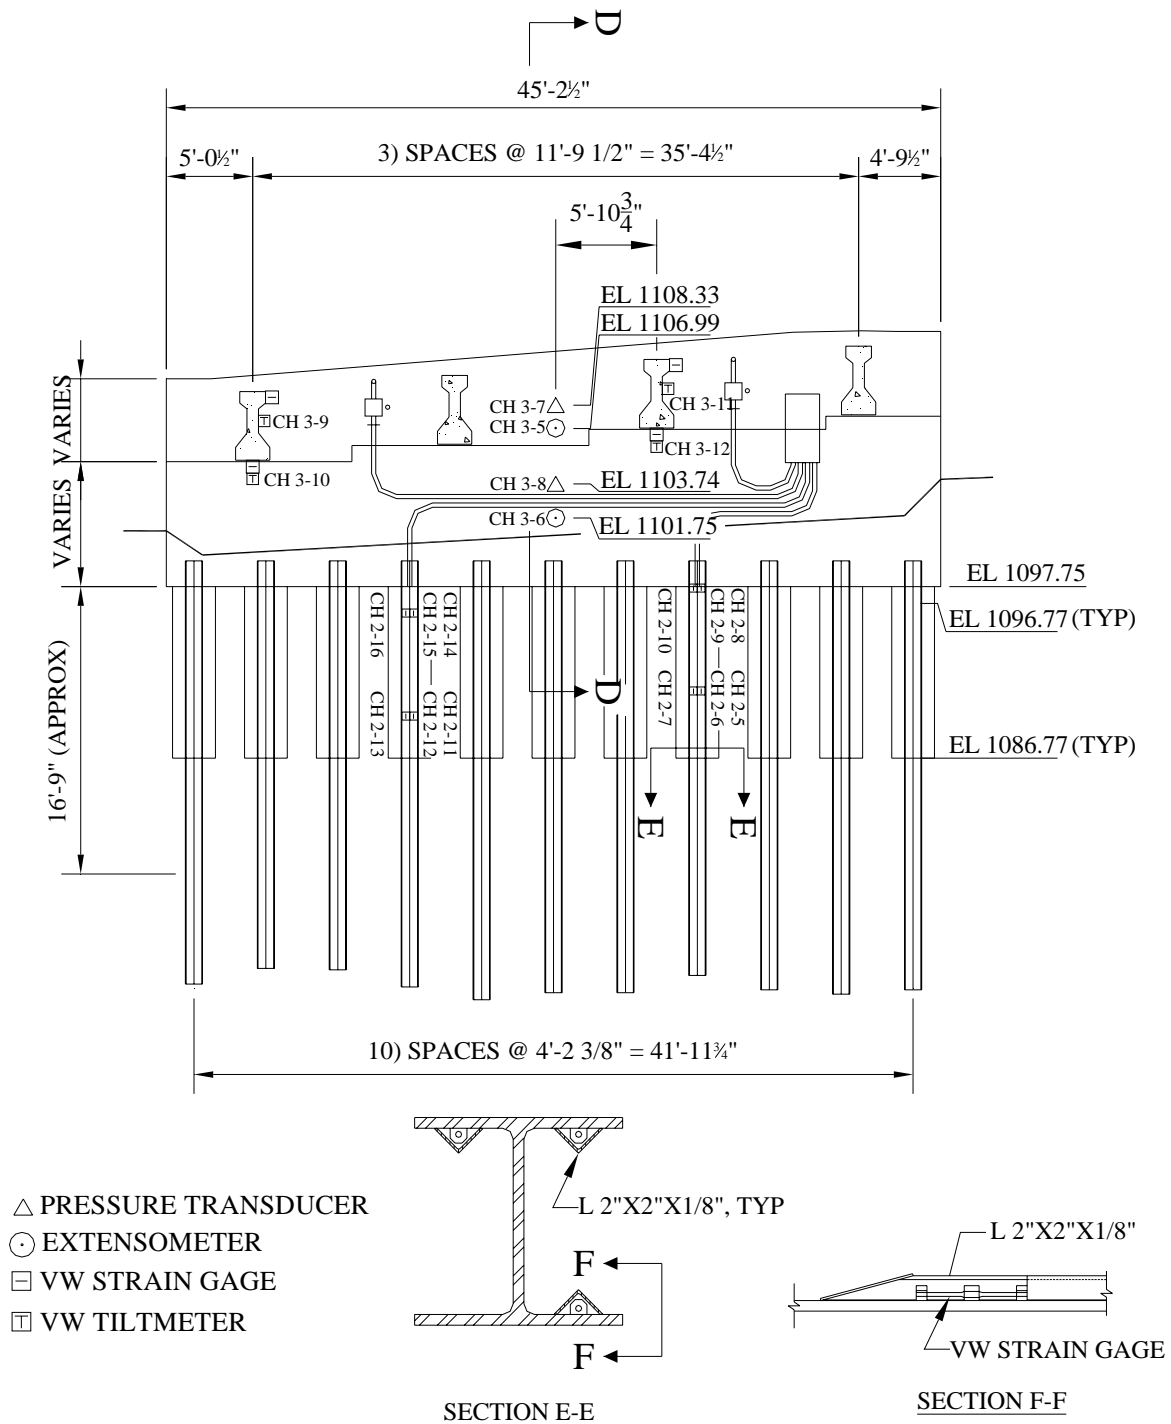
Structure 222 Abutment 1 Elevation (Section C-C).
